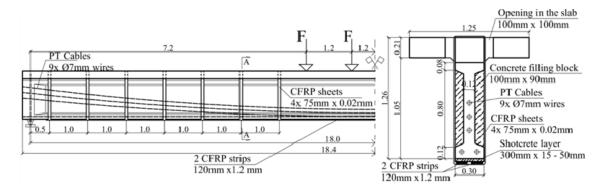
Scheme of laboratory girders, internal steel cables and strengthening configurations.
